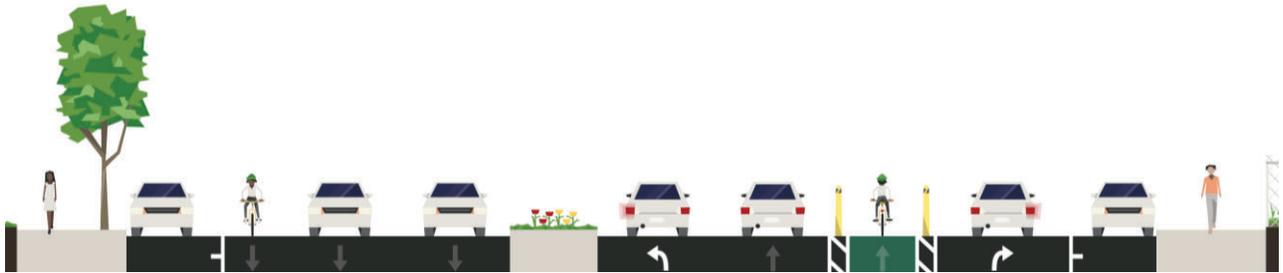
Proposed Cross Section of Evans Avenue on the east side of 3rd Street, looking west
